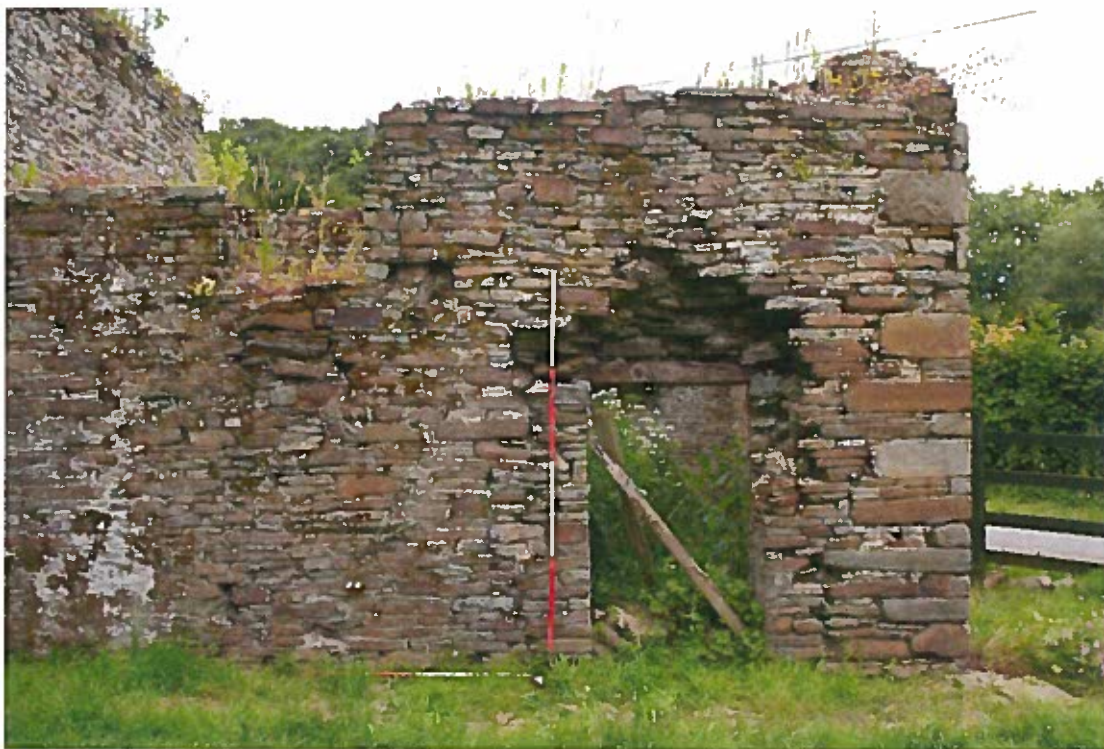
Southwest corner of extension from northwest. Showing doorway and window to upper left. Shot 1.
